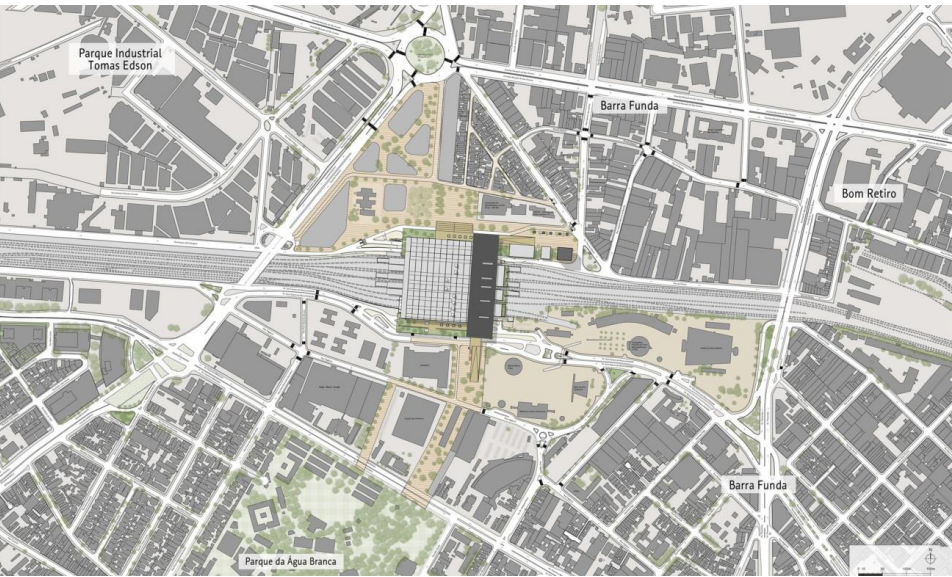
Site plan proposal illustrating the interventions in the surroundings. Source: (STM, 2018)
